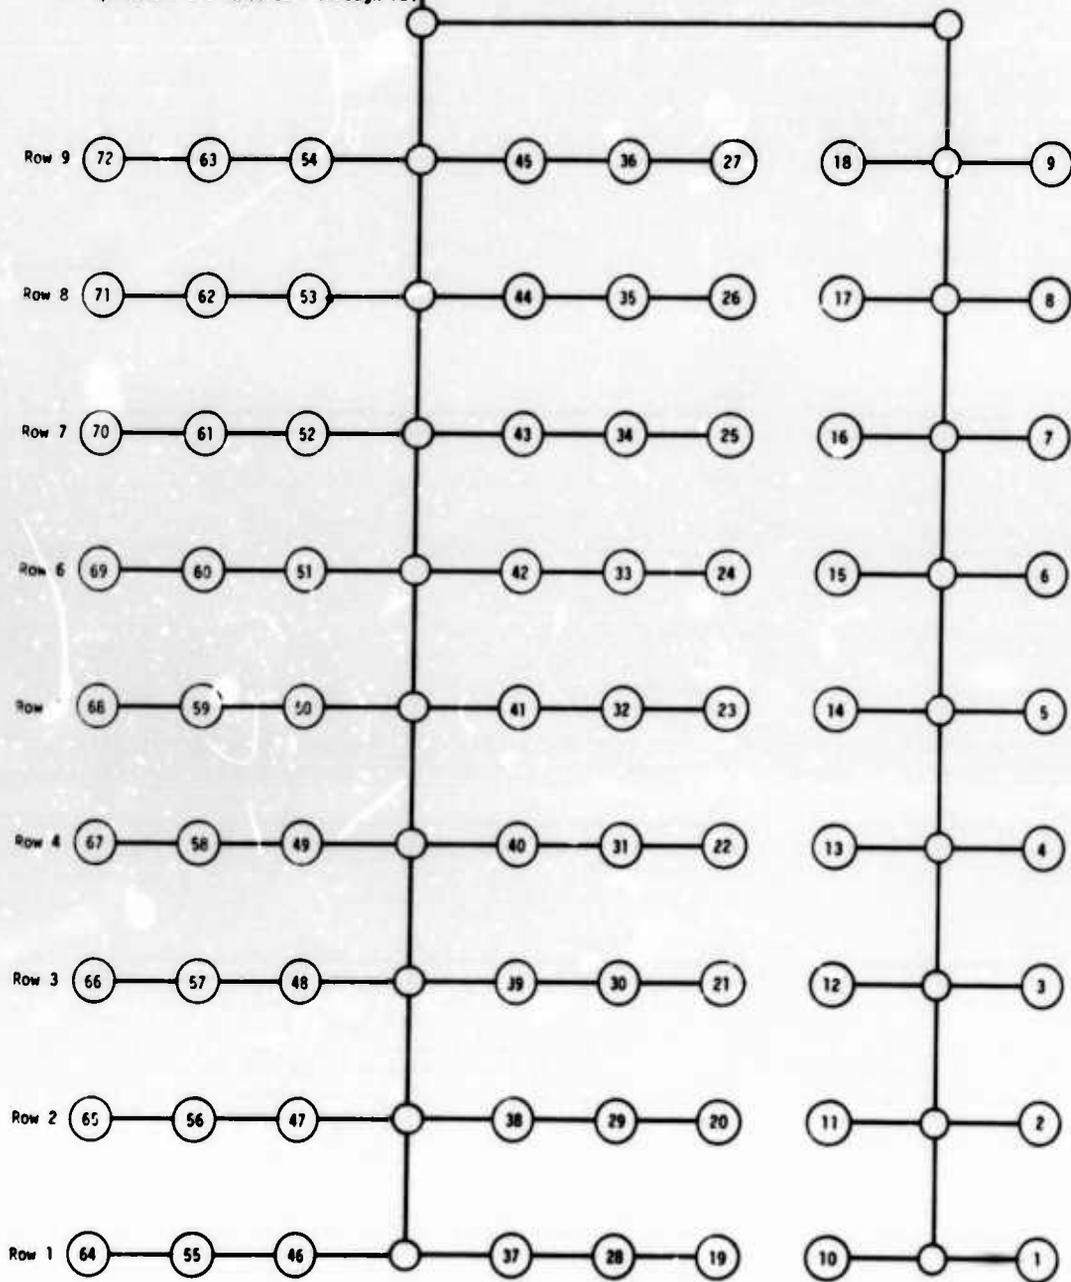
Sprinkler System in Building 783 at McClellan Air Force Base
